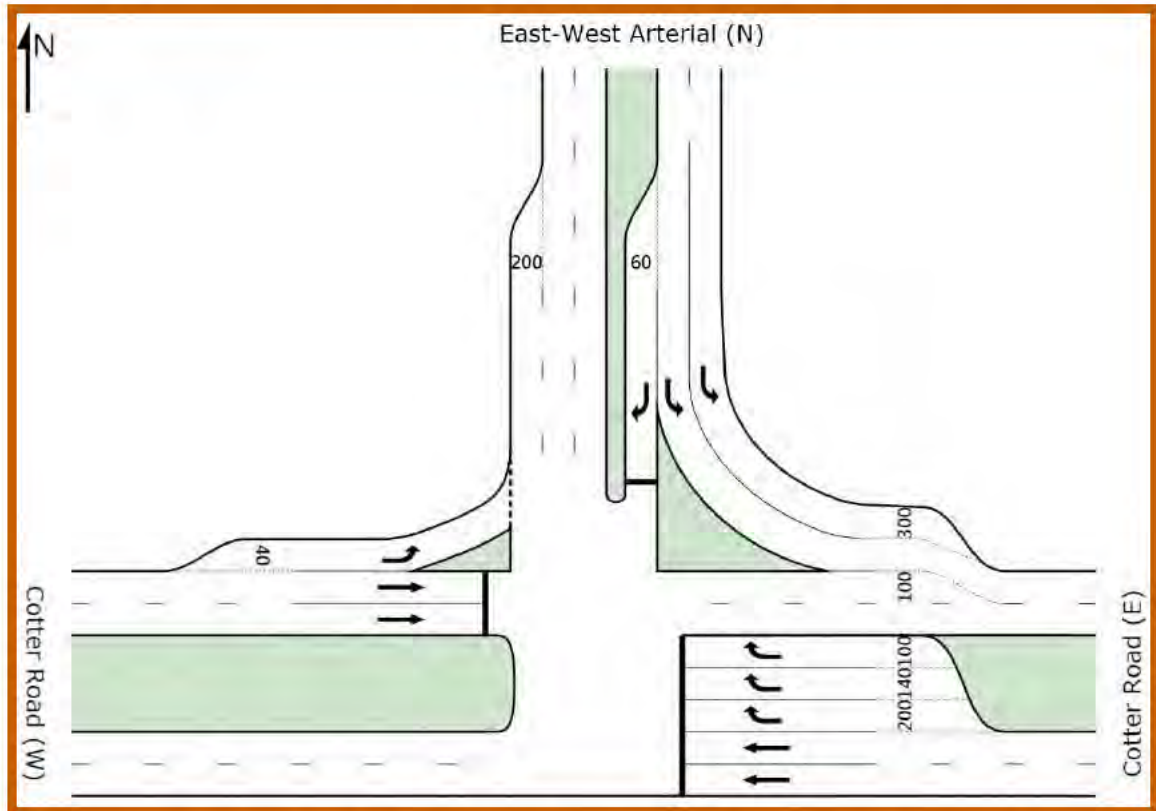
Intersection Layout of Cotter Road – East-West Arterial (Tuggeranong Parkway Bypass 2031)
